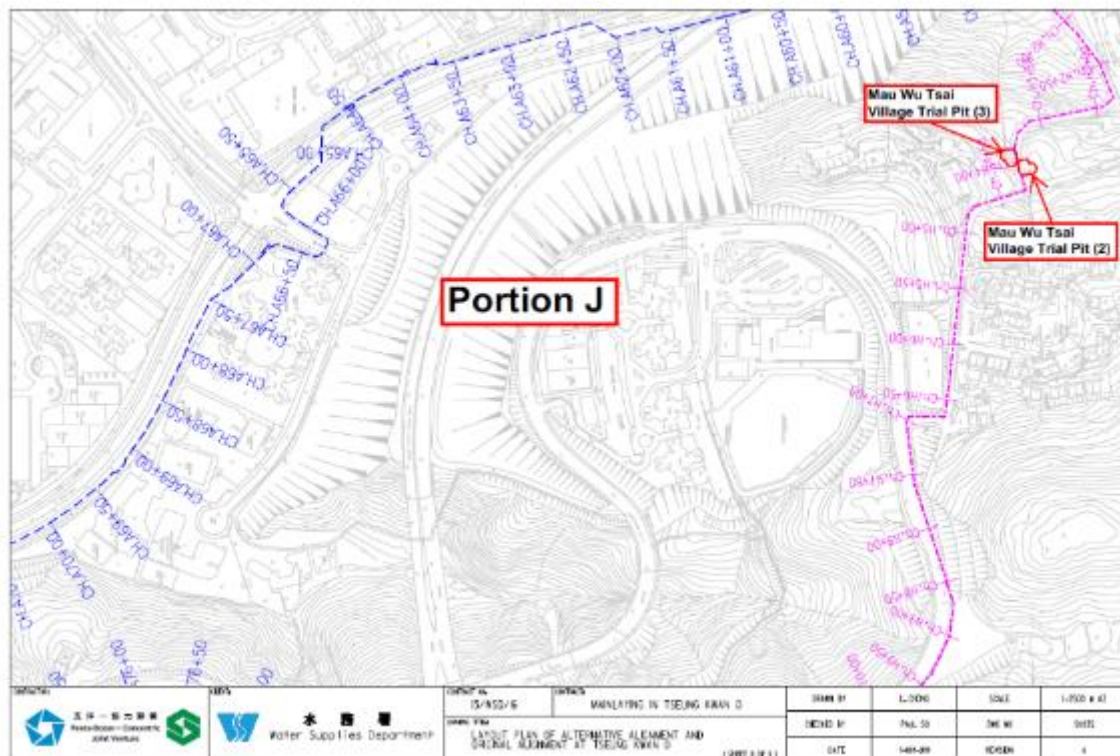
Location Plan for Mau Wu Tsai 2 & 3
